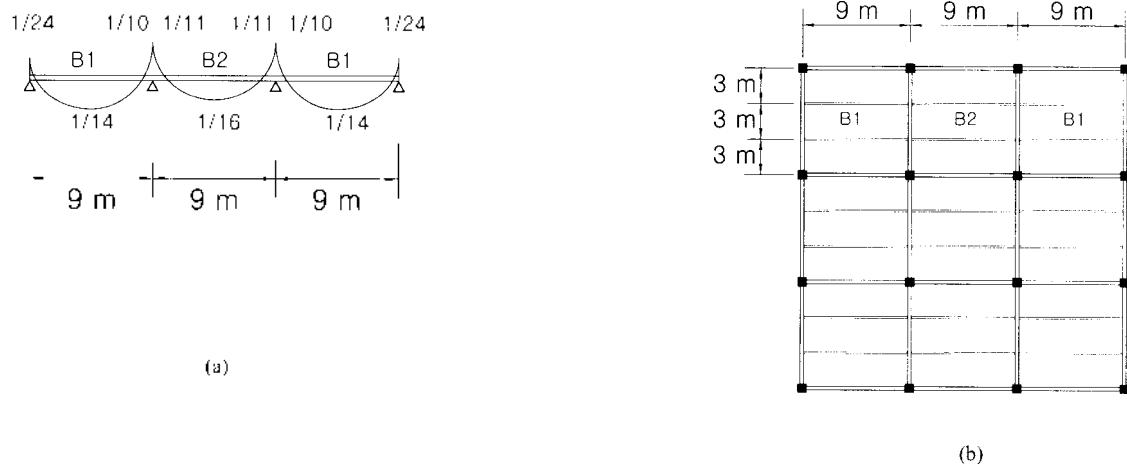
Typical floor plan for the office building: (a) moment coefficients for a continuous beam from the ACI code; and (b) structural floor plan showing beams and girders.
